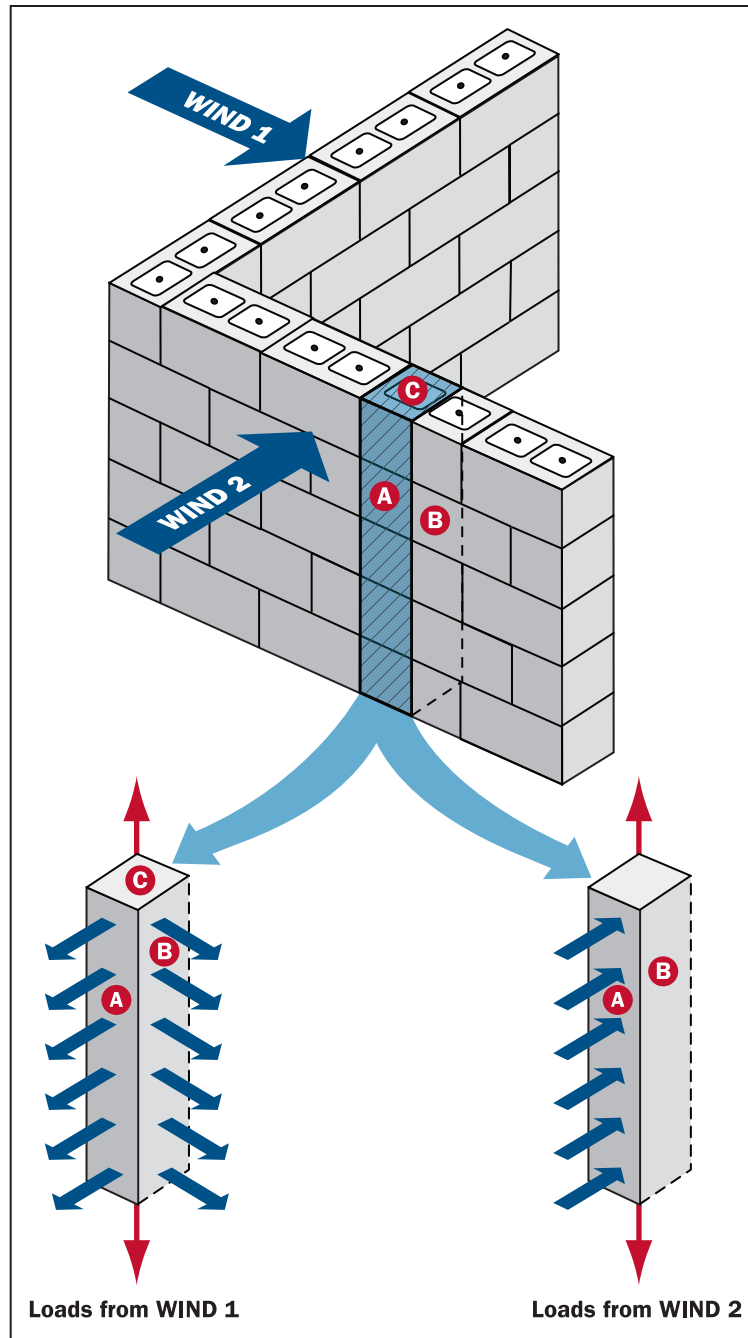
MWFRS combined loads and C&C loads acting on a safe room wall section
